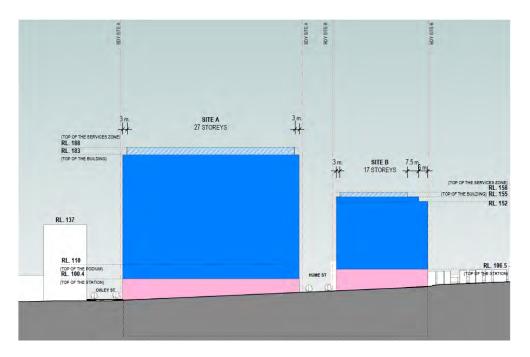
Proposed Crows Nest OSD building envelopes - west elevation (Pacific Highway)
